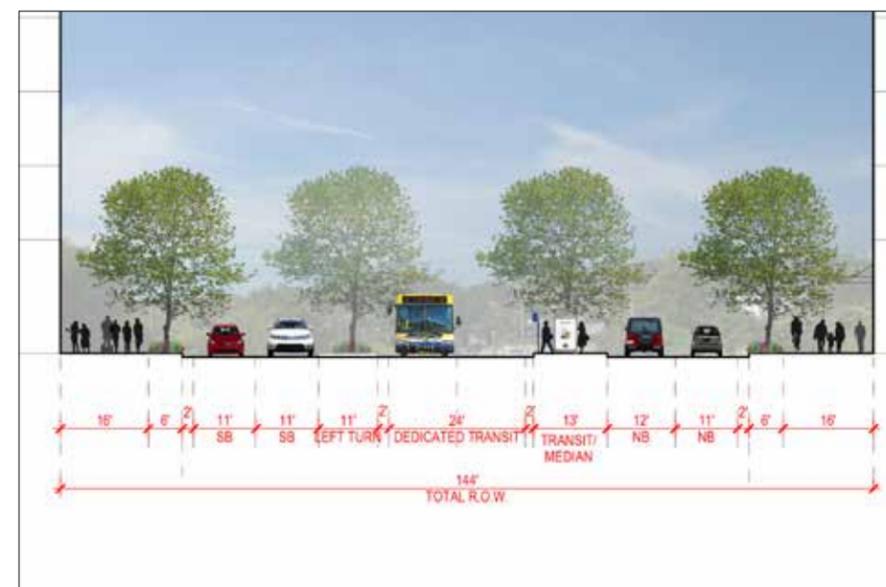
Cross section showing improvements to Van Dorn Street - "A" street
